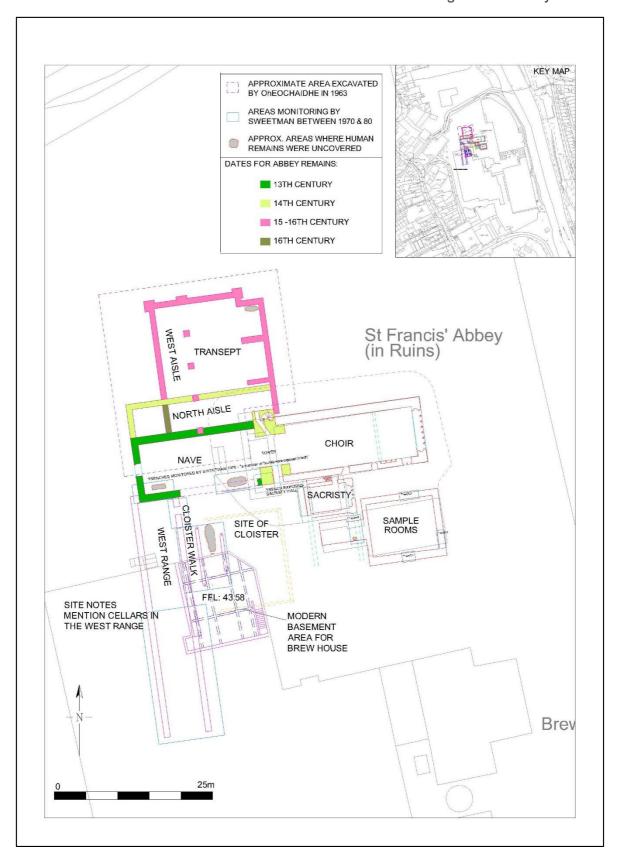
Plan of St Francis' Abbey and investigations and subsurface plant room
